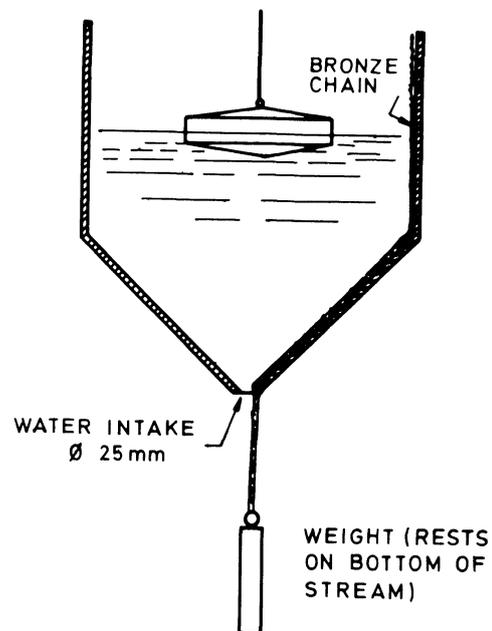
Section of hopper bottom for tube stilling well with weight and chain for cleaning out sediment deposits.
